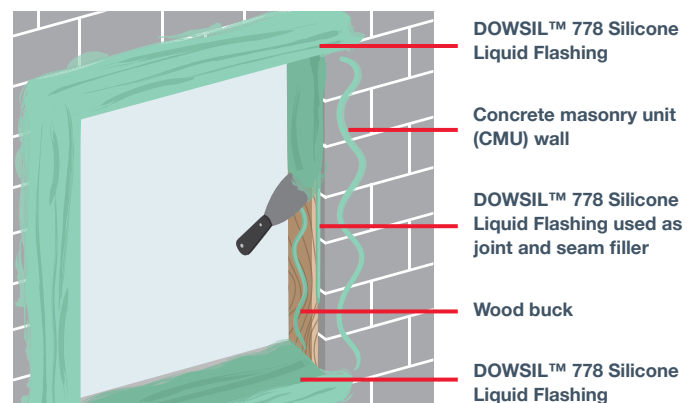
Typical installation applying DOWSIL™ 778 silicone liquid flashing with a spatula.
